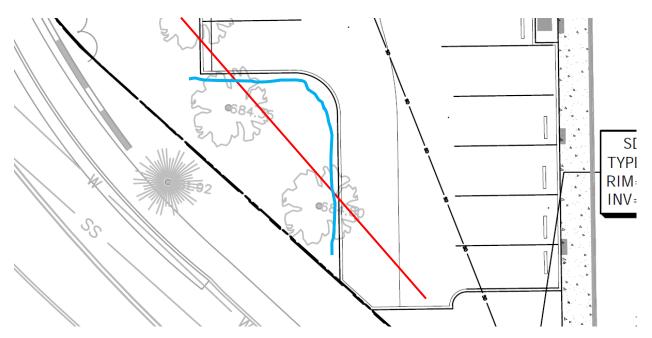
Trees T11 & T12, liquidambar. Note new curb installed adjacent to trees. Some of the new curb will be installed in the same footprint as the existing parking lot (red line is existing curb location). Existing roots will be cut behind new curb (blue line).
